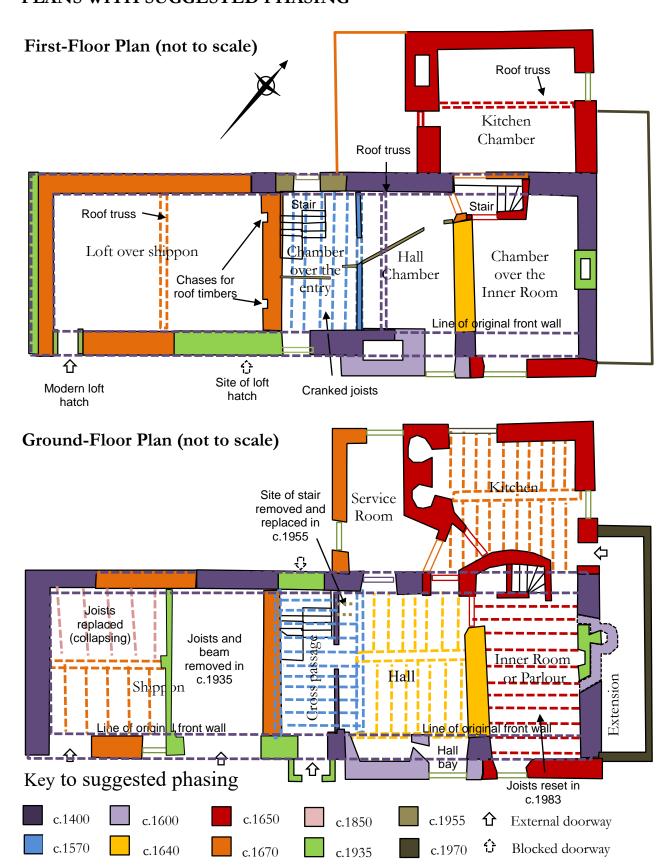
Ground and first-floor plans of Powlesland Farmhouse showing suggested phasing.
